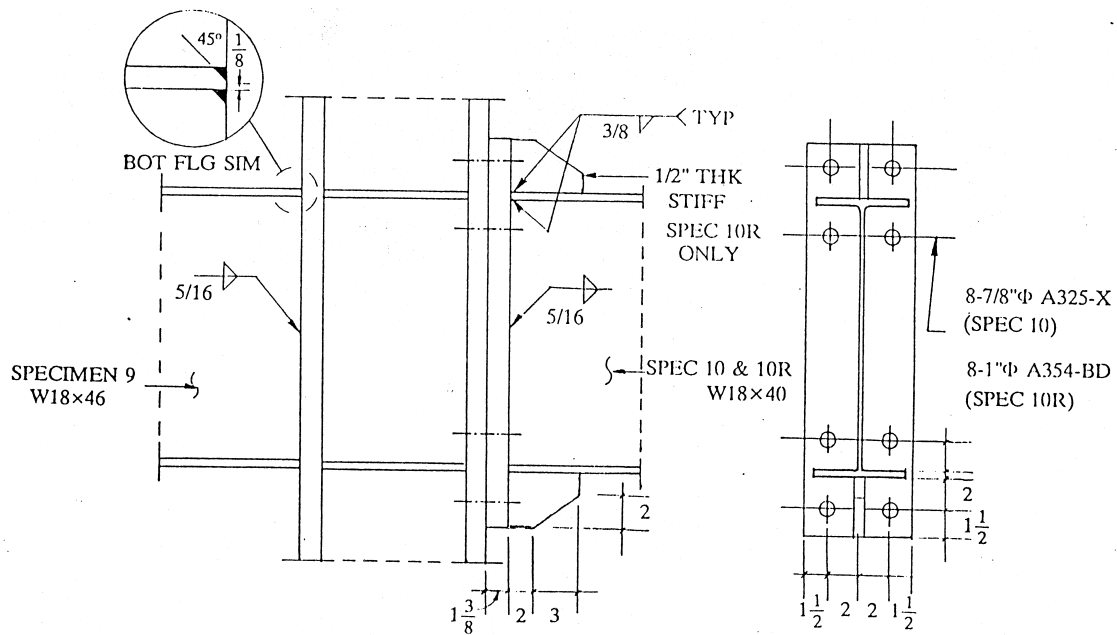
Design details of end-plate connections for Specimens 10 and 10R, and that of direct welding to column, Specimen 9 (K. C. Tsai, E. P. Popov 1988, 1990)
